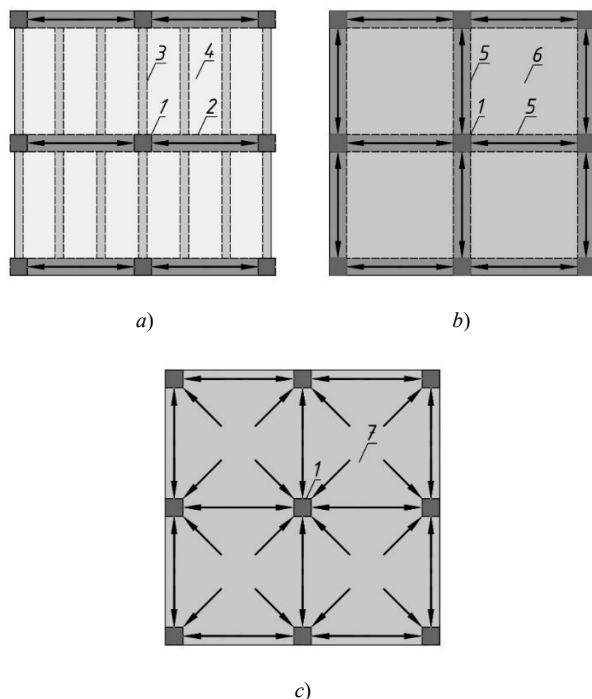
Directions of load transfer to columns: a) – from one-way slab-on-beams floor systems; b) – from two-way slab-on-beams floor systems; c) – from flat plate floor; 1 – column; 2 – main beam; 3 – secondary beam; 4 – one-way slab; 5 – beam; 6 – two-way slab; 7 – flat plate floor
